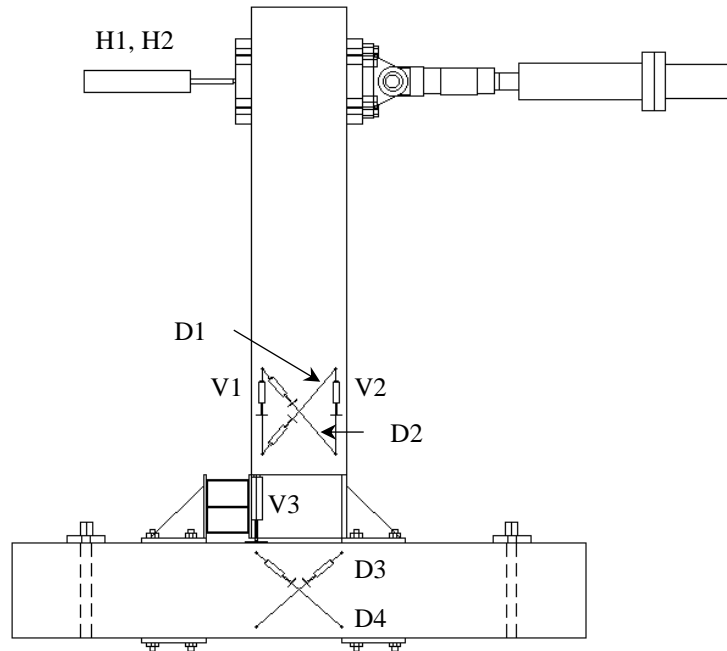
Instrumentation with LVDTs (specimen P-ID-1).
